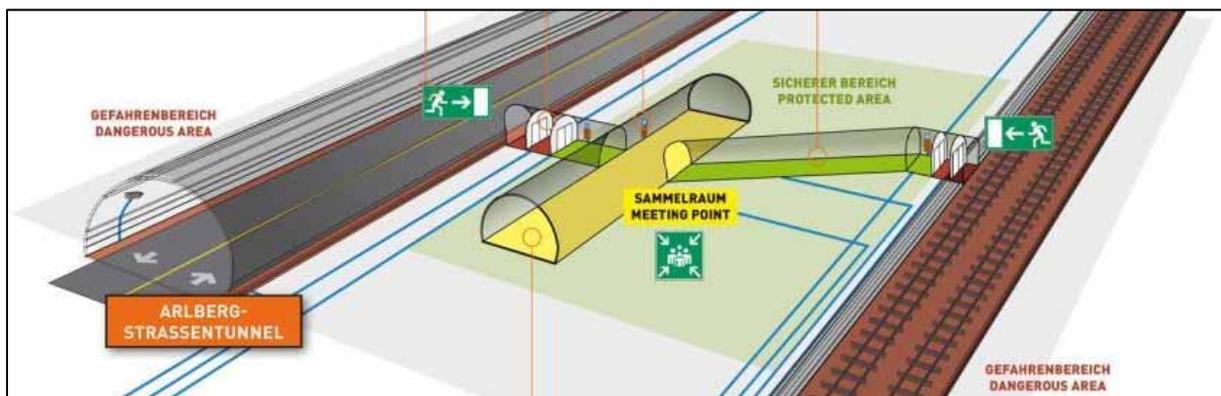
Example of an egress way in Arlberg road tunnel (ASFINAG).
